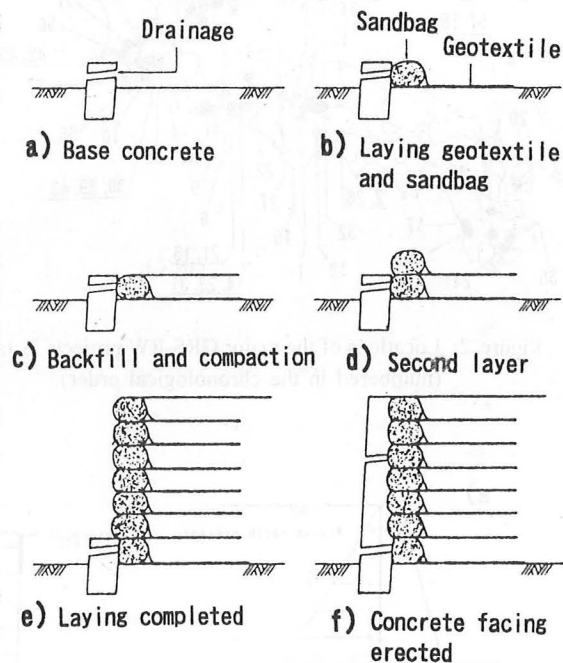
Standard staged construction procedures for a GRS-RW; a) concrete base; b) geotextile and gravel bags placement for the first layer; c) backfill and compaction; d) placement of the second layer of geotextile and gravel bags; e) all layers constructed; f) concrete facing constructed.
